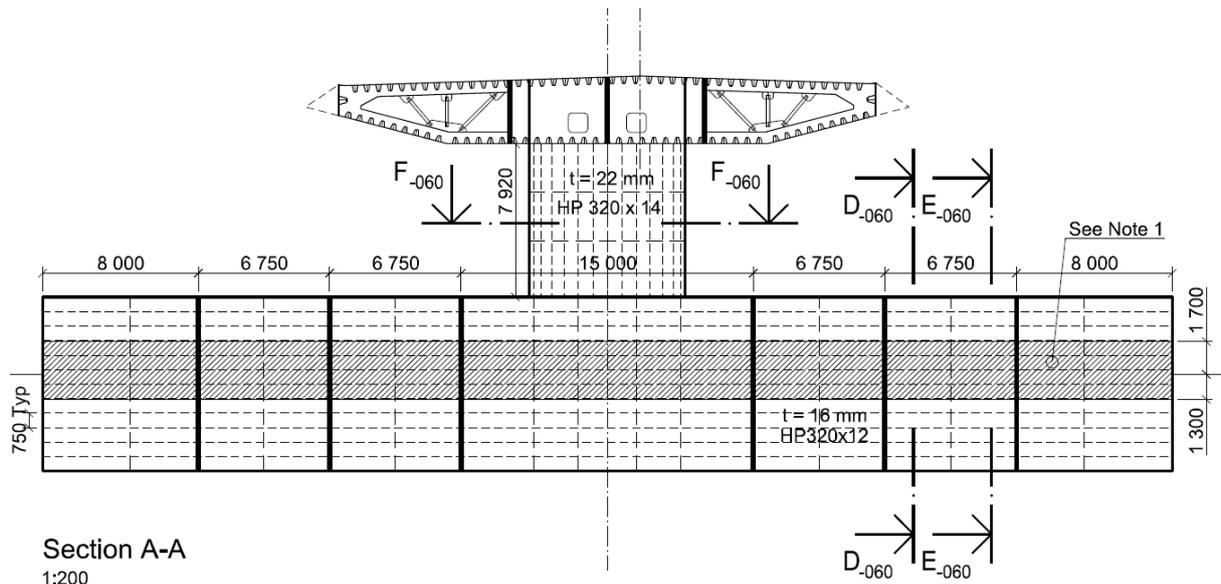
Typical pontoon - side view – shaded area indicate splash zone with 25CR DSS
